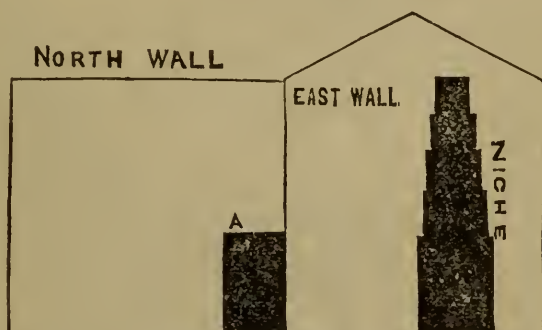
Plane figure of east and north walls of Queen's Chamber Entrance at A.
